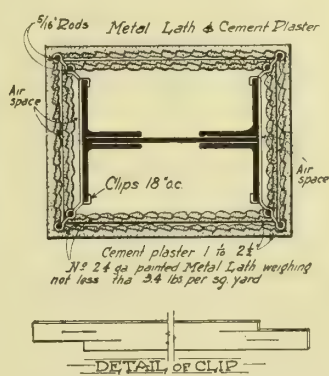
DOUBLE WALL-COLUMN PROTECTION
